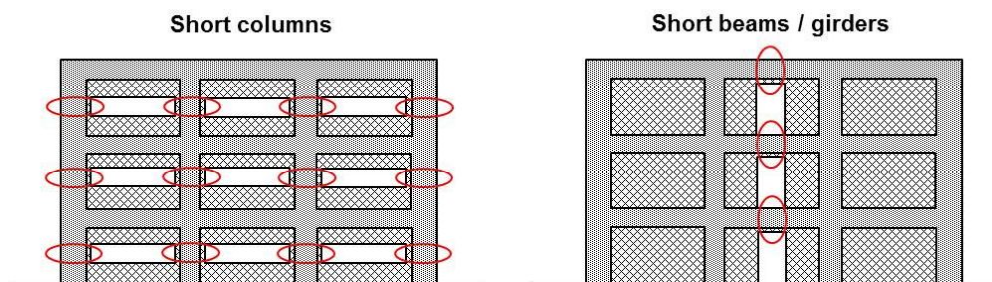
SHORT COLUMNS AND SHORT BEAMS
